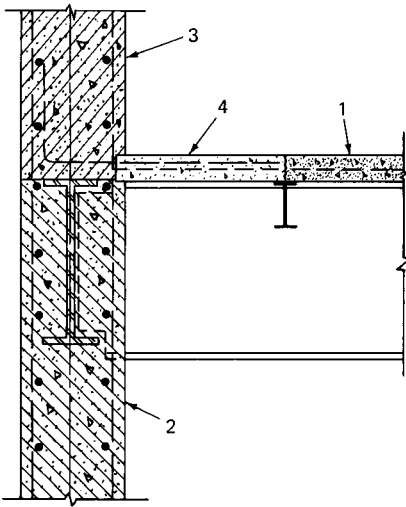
Shear wall construction sequence. (1) Concrete topping over composite metal deck is poured on several levels; (2) shear walls below the lowest concreted floors are poured; (3) shear wall form work is raised to the next floor through temporary floor openings in metal deck and walls on the next floor are poured; (4) temporary openings are filled around shear walls to establish diaphragm action.
